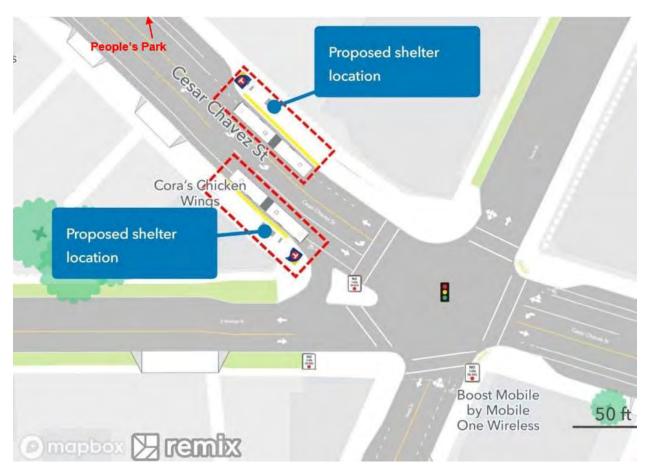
Cesar Chavez Street and State Street South Concept Plan in area of People's Park.
